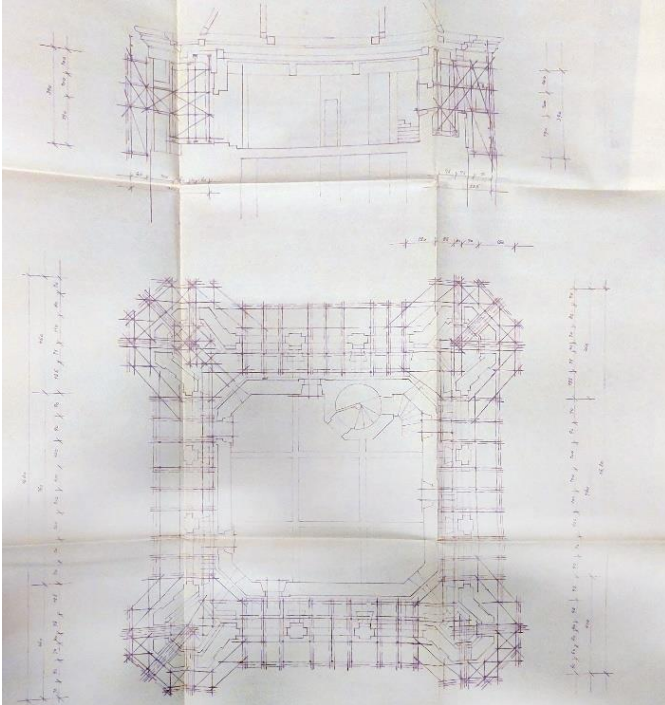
St. Vitus Church – perimeter scaffolding of the gallery – floor plan and vertical section [24]
